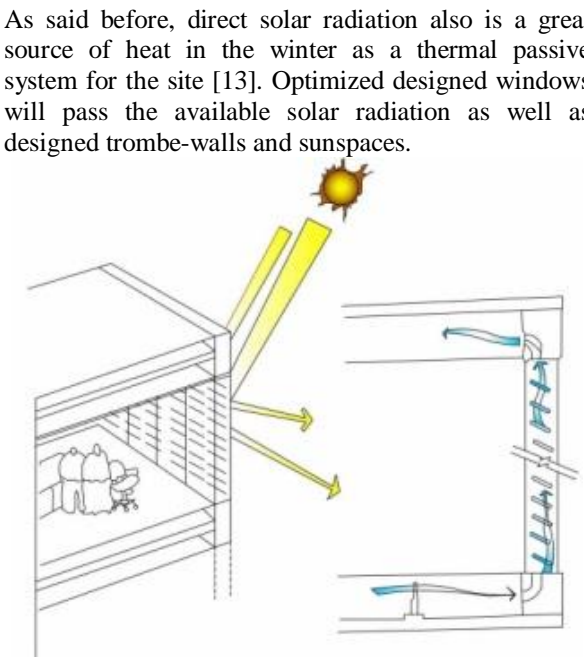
Triple glazed ventilated wall with plane blinds (east & west elevation)
